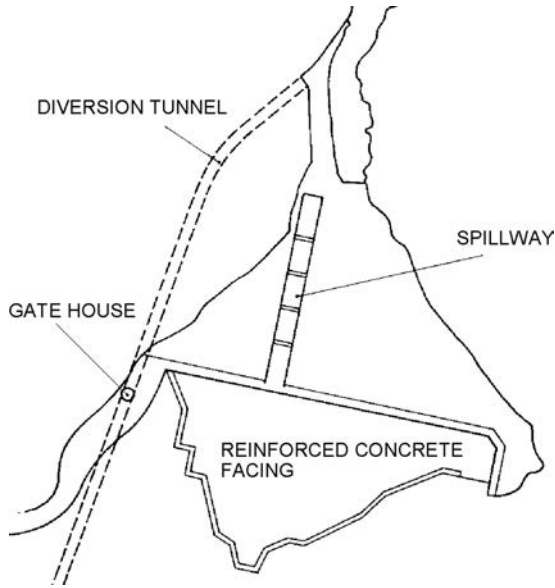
Spillway over embankment dam with reinforced concrete facing (layout).
